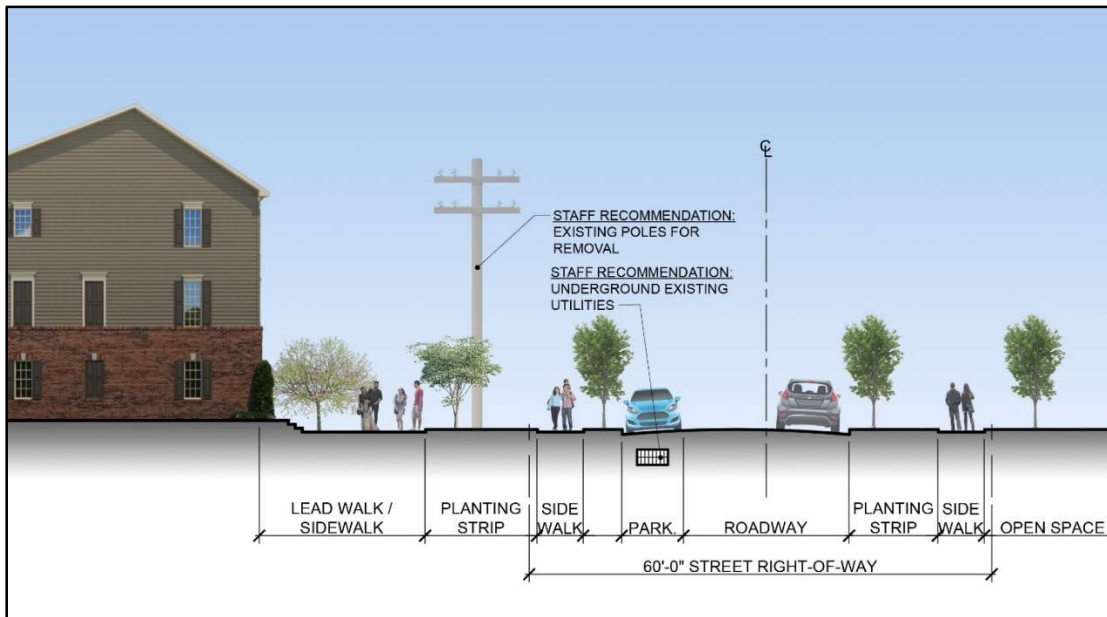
Proposed Site Section for Liberty Mill Road in front of Lots 8-13
